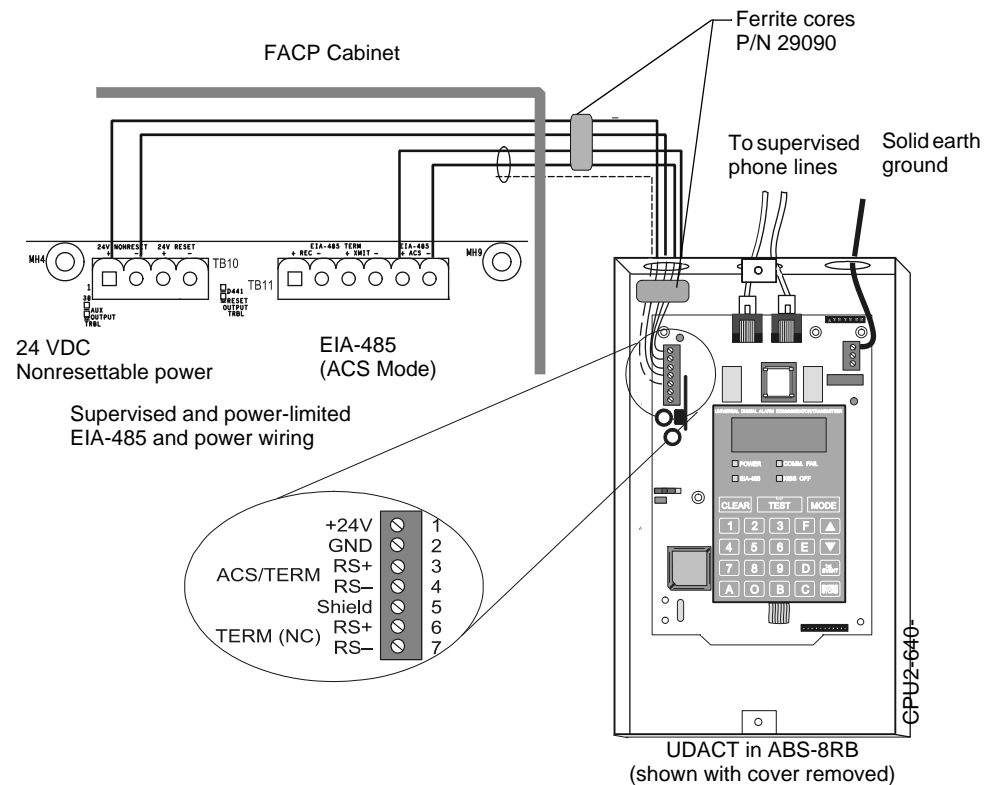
Typical Wiring Diagram for a Central Station Fire Alarm System
